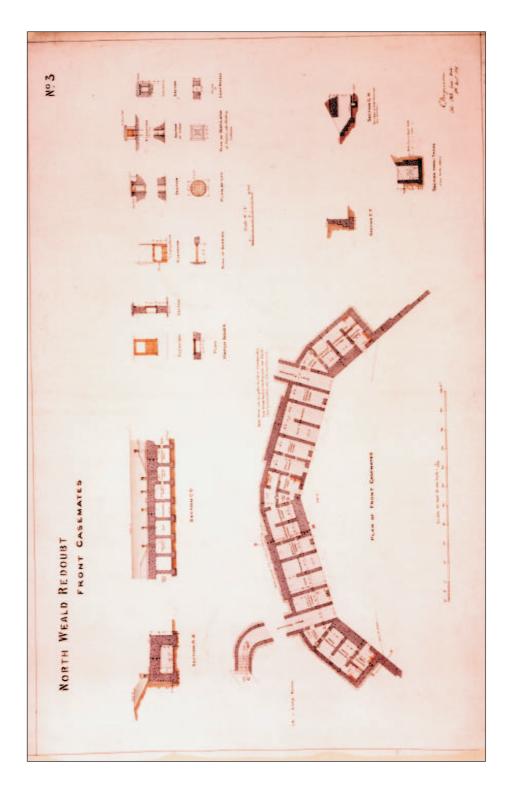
North Weald Redoubt - 1893 plans and sections of the Front Casemates (PRO WO/78/2606 (3)
